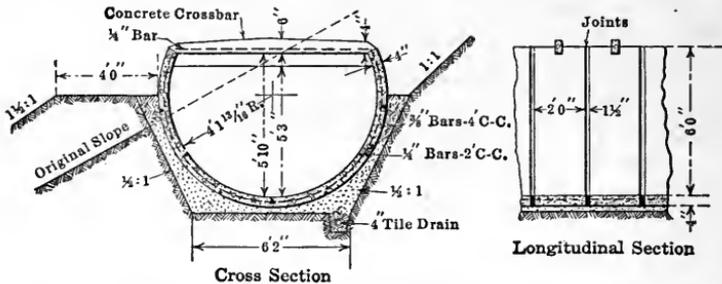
Reinforced concrete sectional lining. Tieton Project, Wash.
